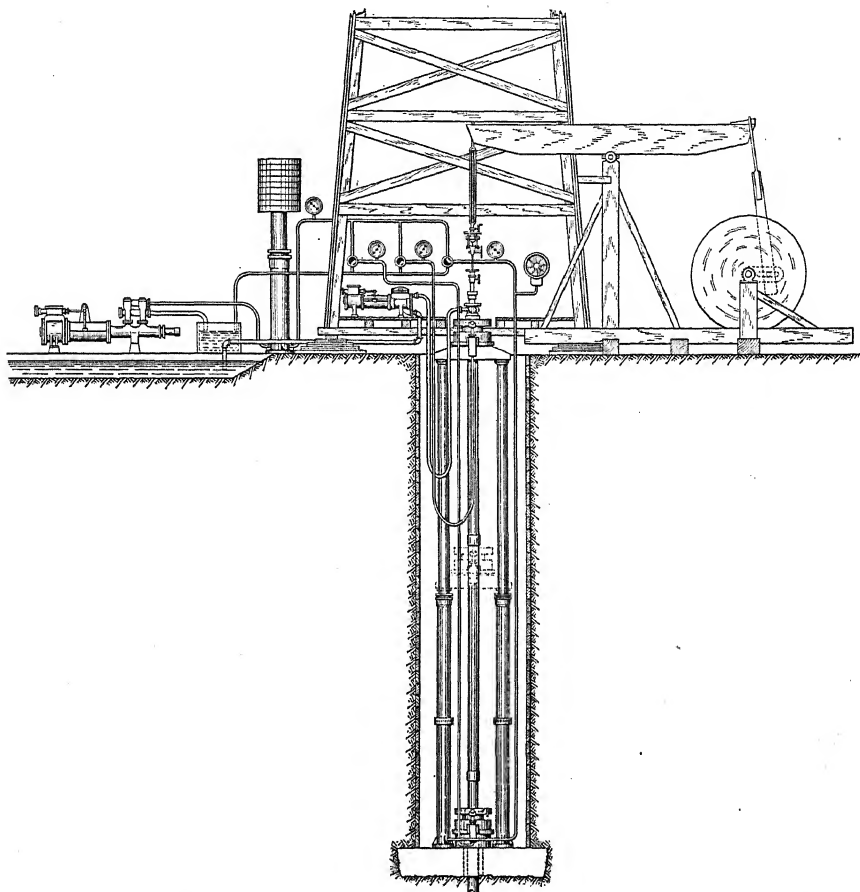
HYDRAULIC ELEVATOR FOR MOVING CASING, USED IN CONNECTION WITH CIRCULATOR SYSTEM. (PATENTED.)
